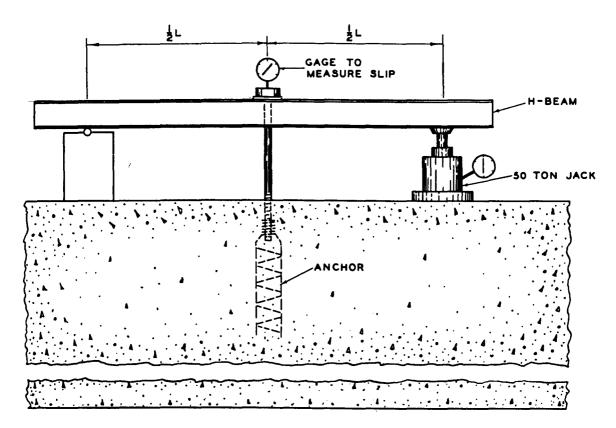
Schematic plan view of device to test form anchors evidenced by movement of the head of the anchor bolt, was measured to 0.0001 in. with a dial gage separately mounted from the pulling rig. Failure was judged to have occurred when the concrete cracked or a movement of 1/16 (0.0625) in. was observed on the gage.
